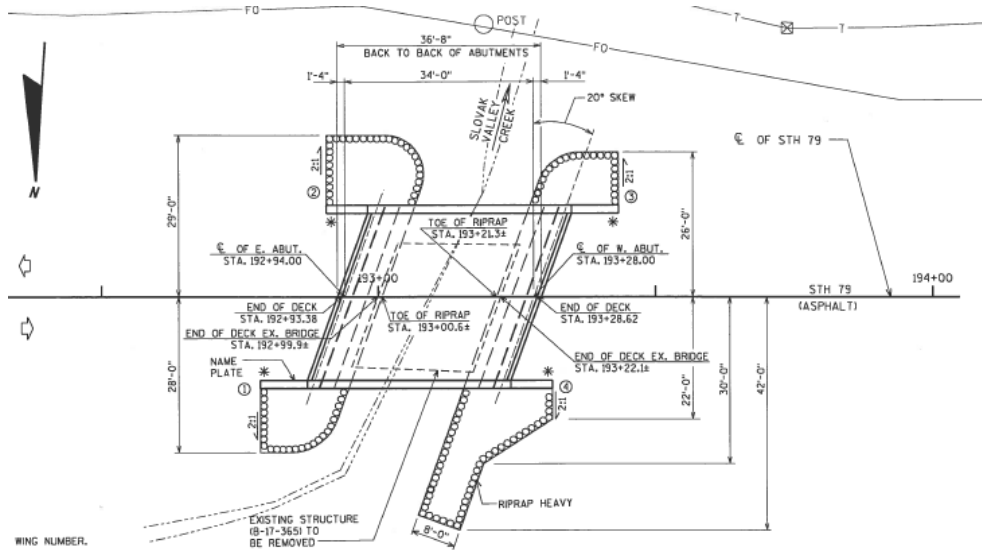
Slovak Valley Creek Bridge plan view (from project plans)
